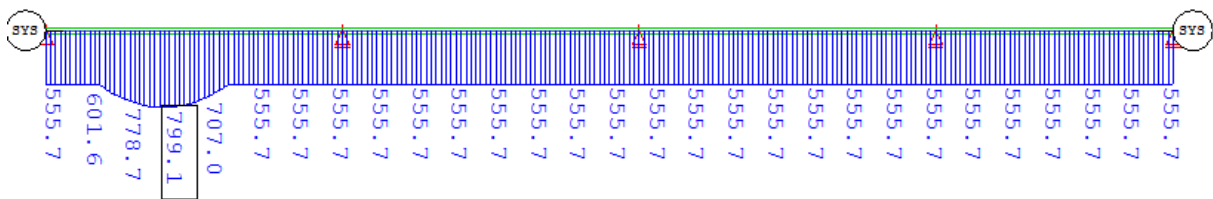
Longitudinal reinforcement after 3rd optimization step, segment phase, concrete variant
